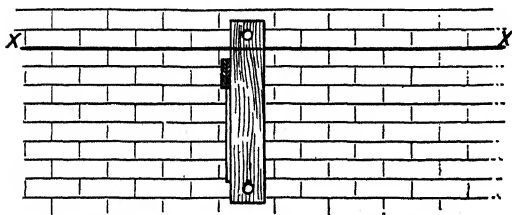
MARKING OUT POSITION OF BRACKETS ON WALL
